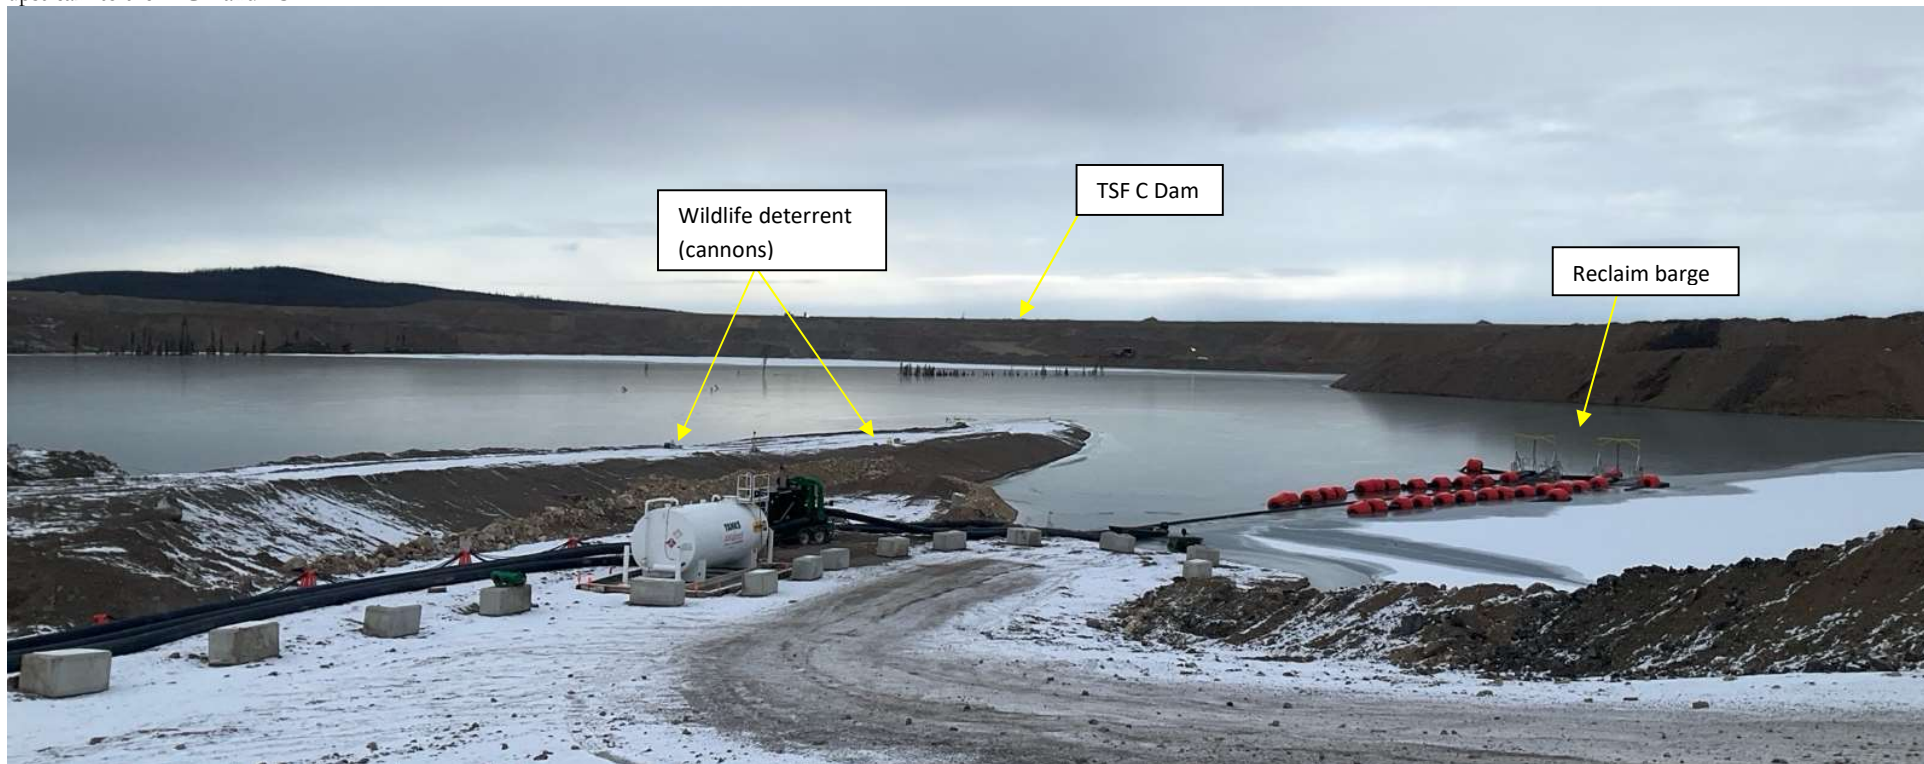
Overview of TSF and reclaim barge that draws water and sends it to the Plant Site to be used for processing. Location of wildlife deterrents indicated on photo.
